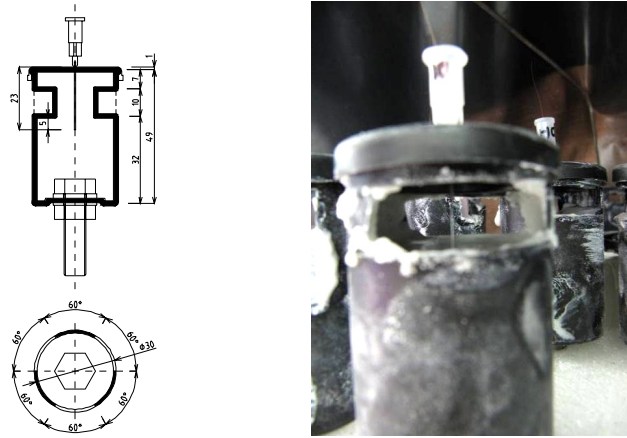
Specimen for pullout test – drawing (left) and photo (right) [6]
